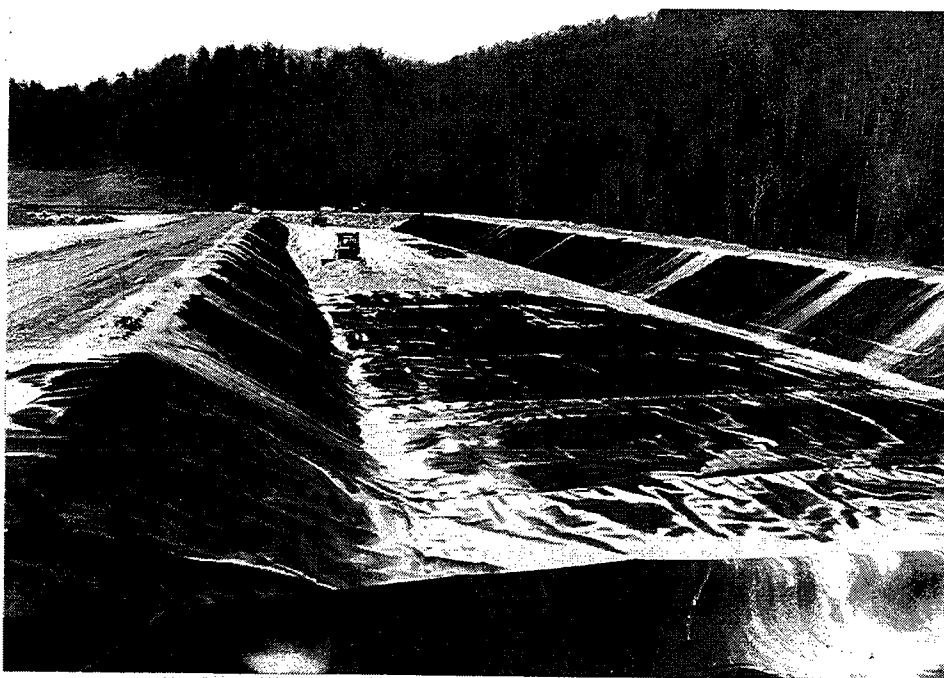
Geomembrane encapsulation area showing trench concept and placement of geomembrane; note geomembrane anchoring scheme along left side.
